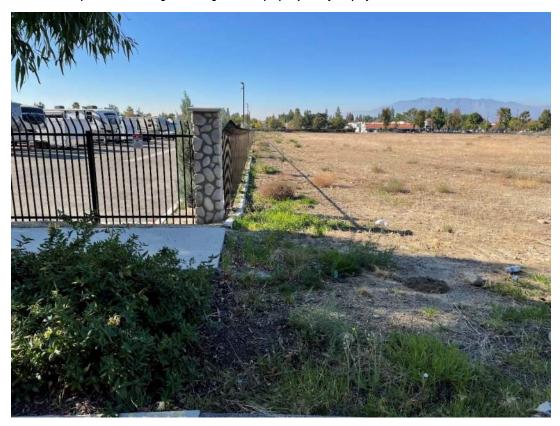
On Naples Avenue at the Wabash Avenue intersection looking southeasterly across project site.
